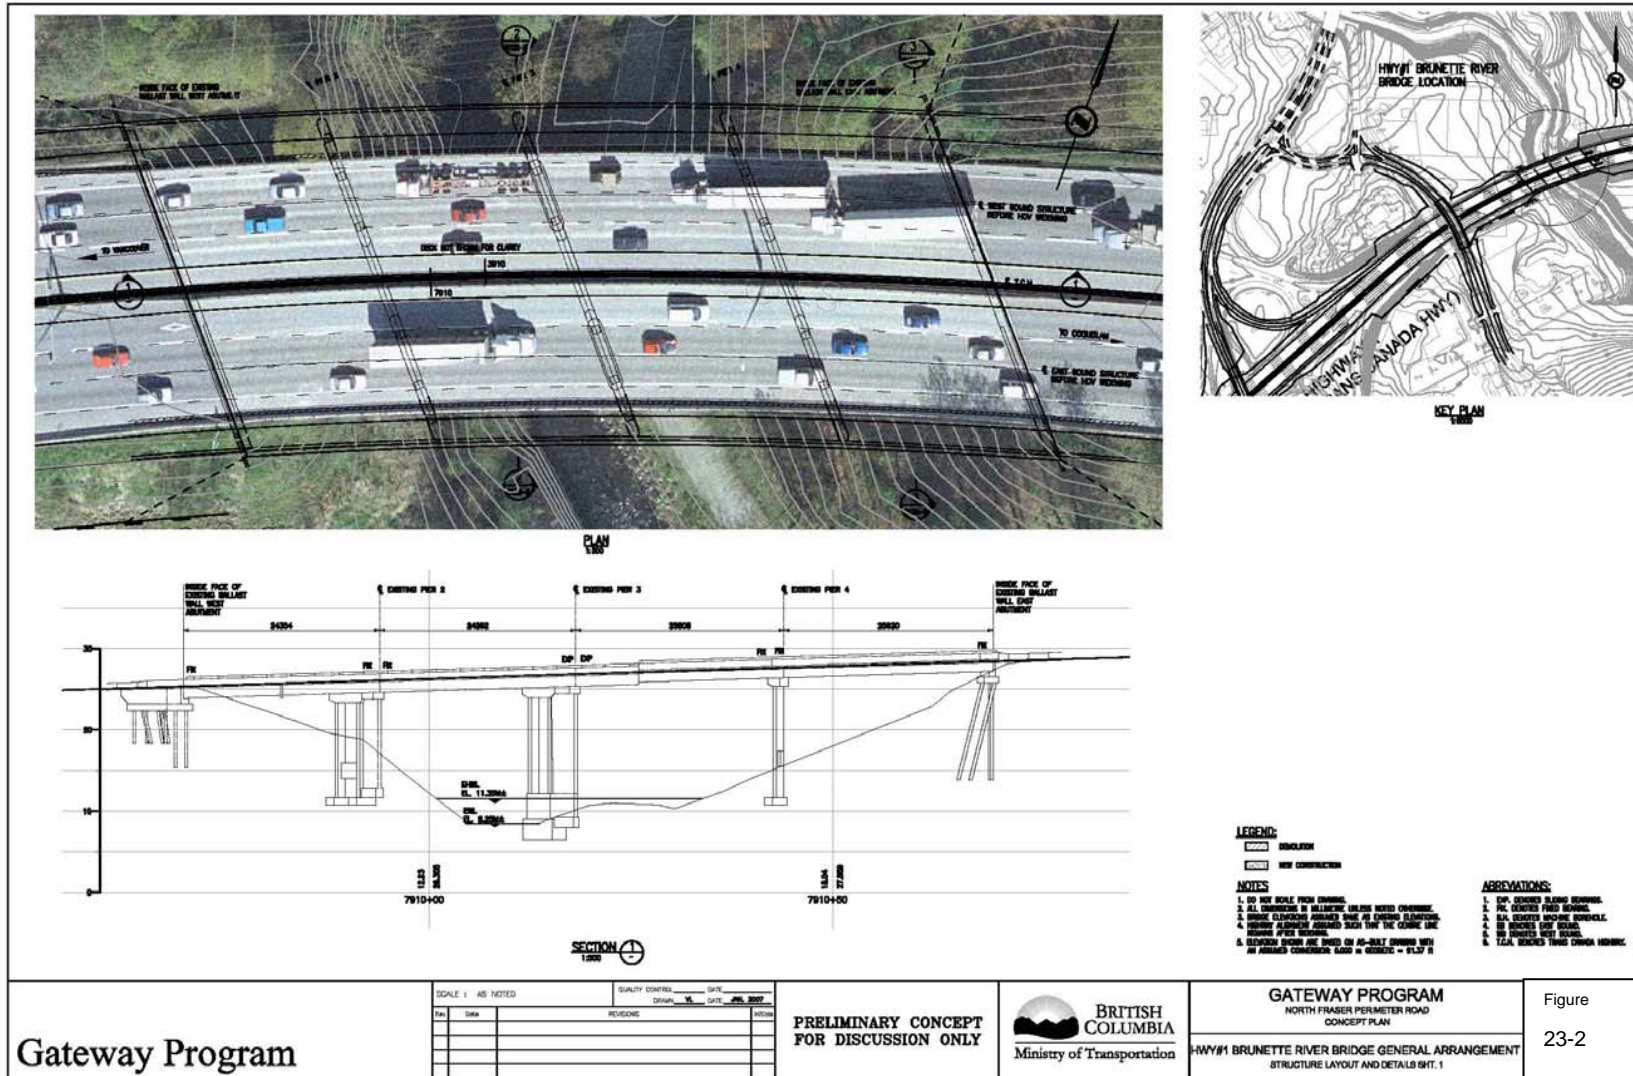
Elevation Drawing of Brunette River Bridge Widening
